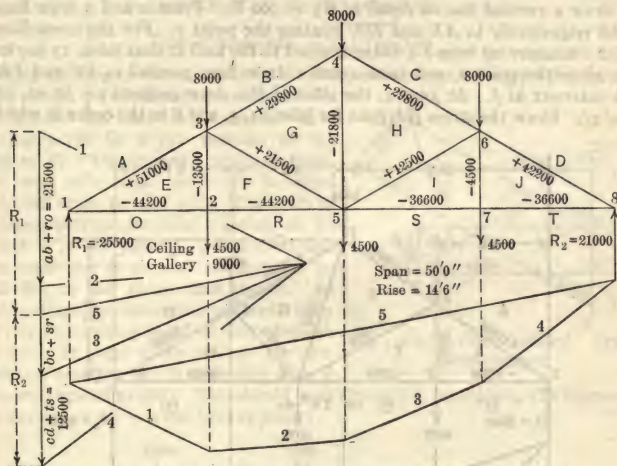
King-rod Truss. Truss-diagram and Equilibrium-polygon
